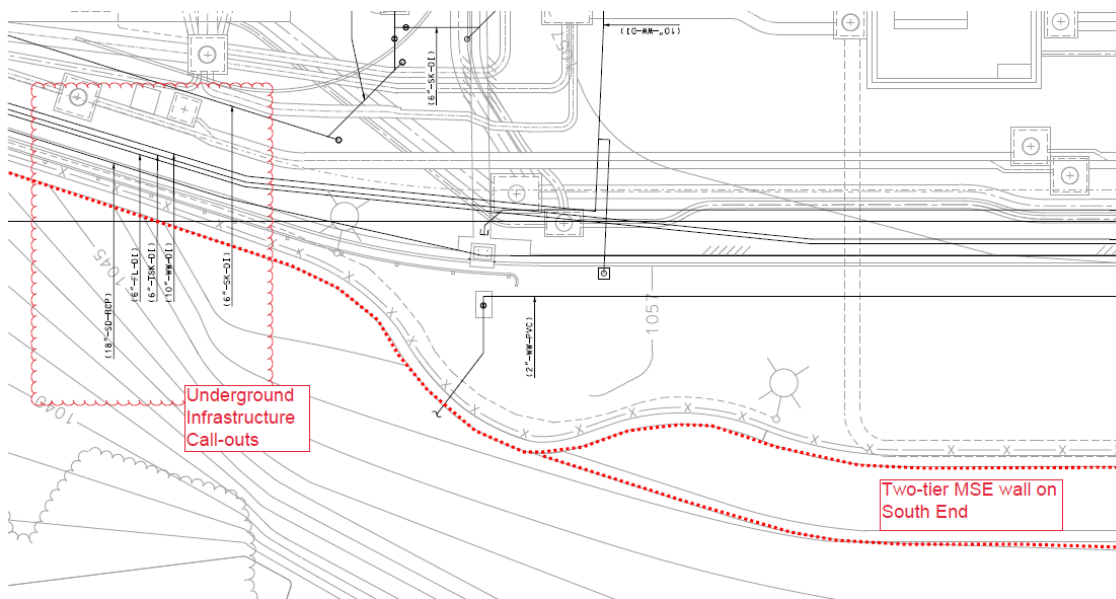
Plan excerpt showing crowded subsurface infrastructure just behind existing MSE wall.
